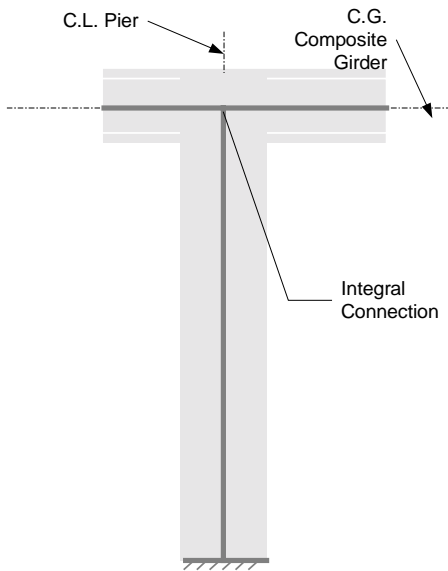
Integral Pier Connection on a Fixed Height Idealized Pier
